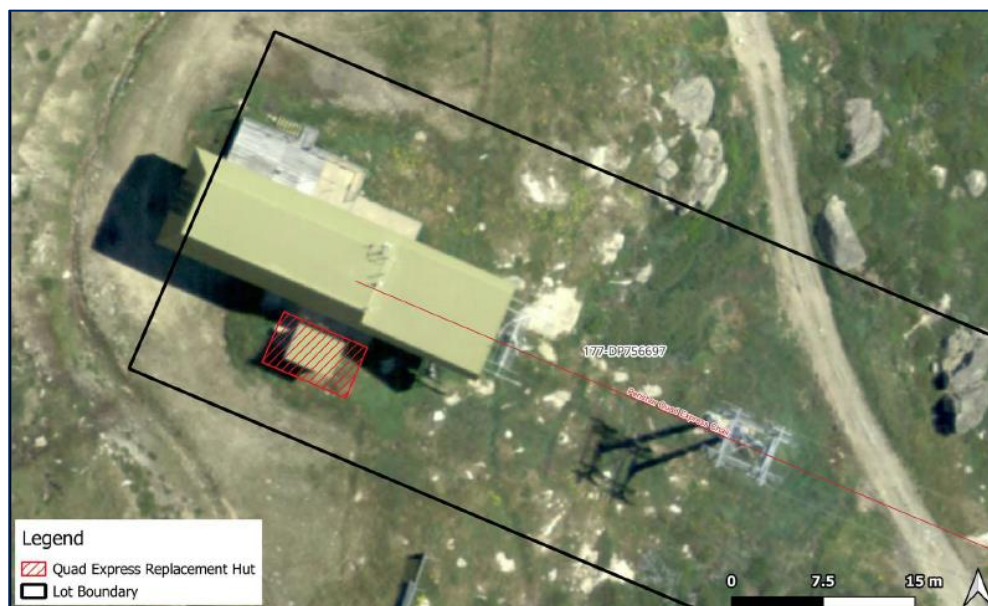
| Lift Operators Hut location adjoining the Top Station (Source: Applicant's documentation)
